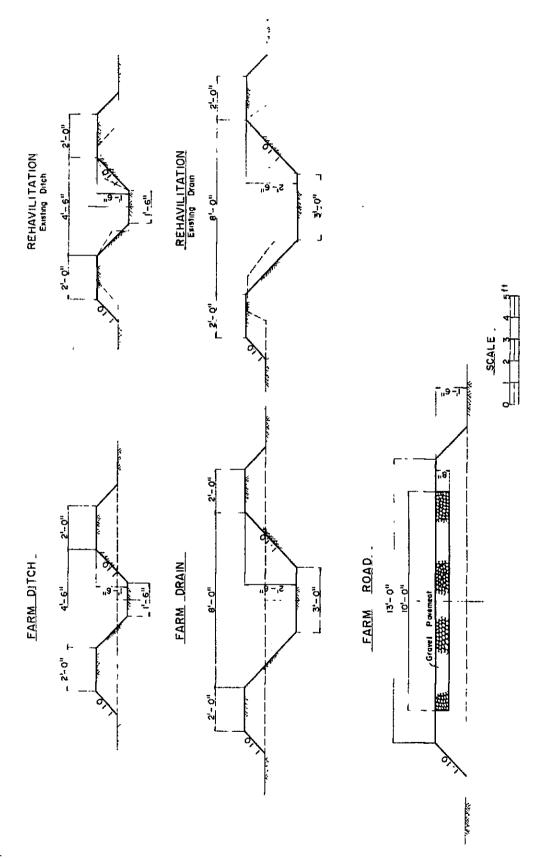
Standard Gross Sections of Ditch Drain & Road
